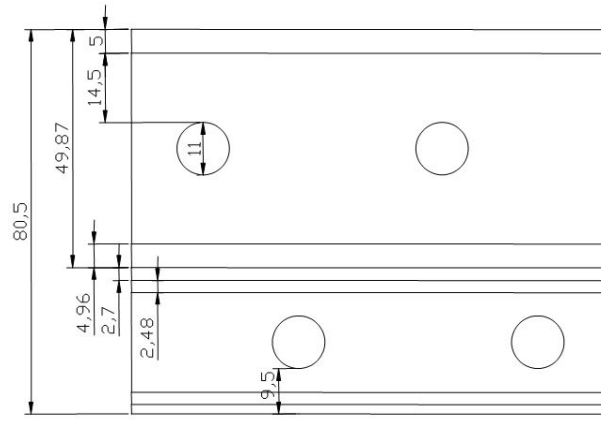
Flange perforations of the test specimen (dimensions in mm)
